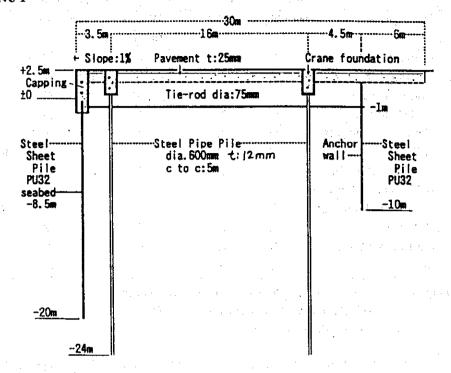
Typical Cross-Section of Proposed Quay wall
